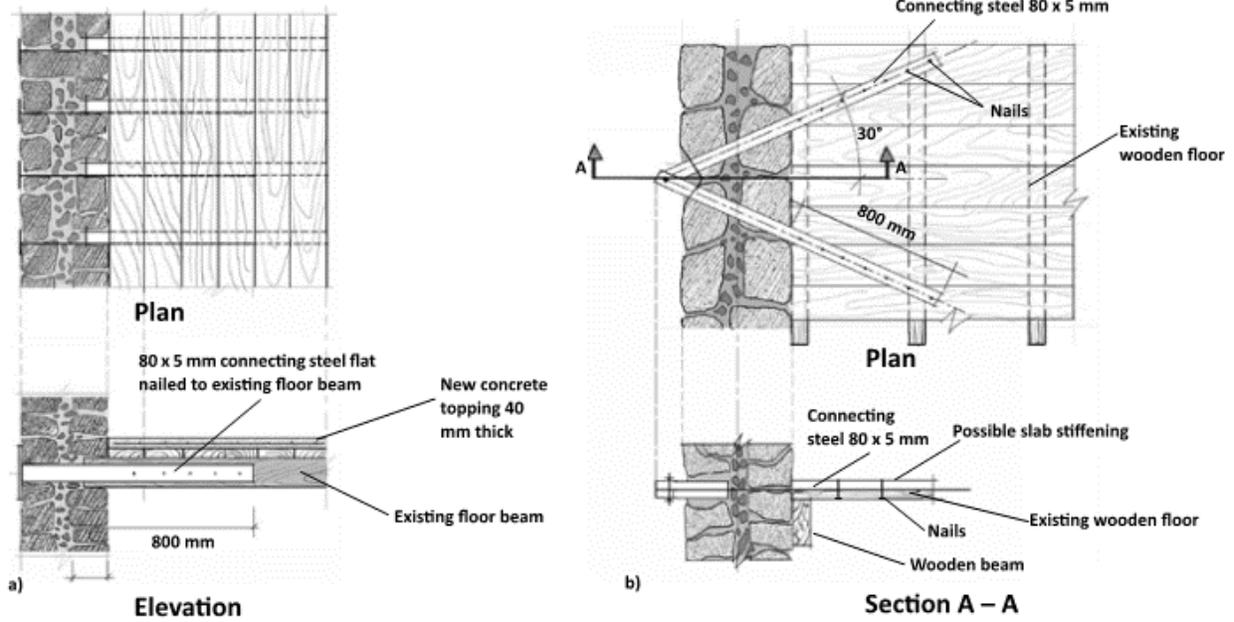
Steel straps for wall-to floor anchorage: a) floor beams perpendicular to the wall, b) floor beams parallel to the wall (Bothara & Brzev, 2011)
